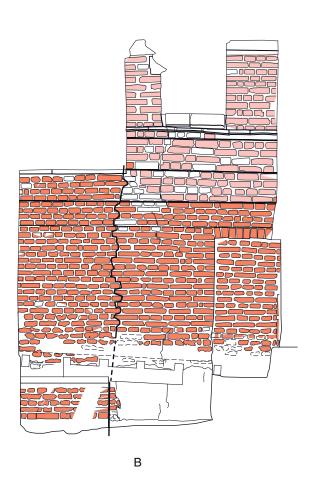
Hampton Court Palace, Base Court V, East Facing Elevation of Clock Court, Parapet Internal Elevation
